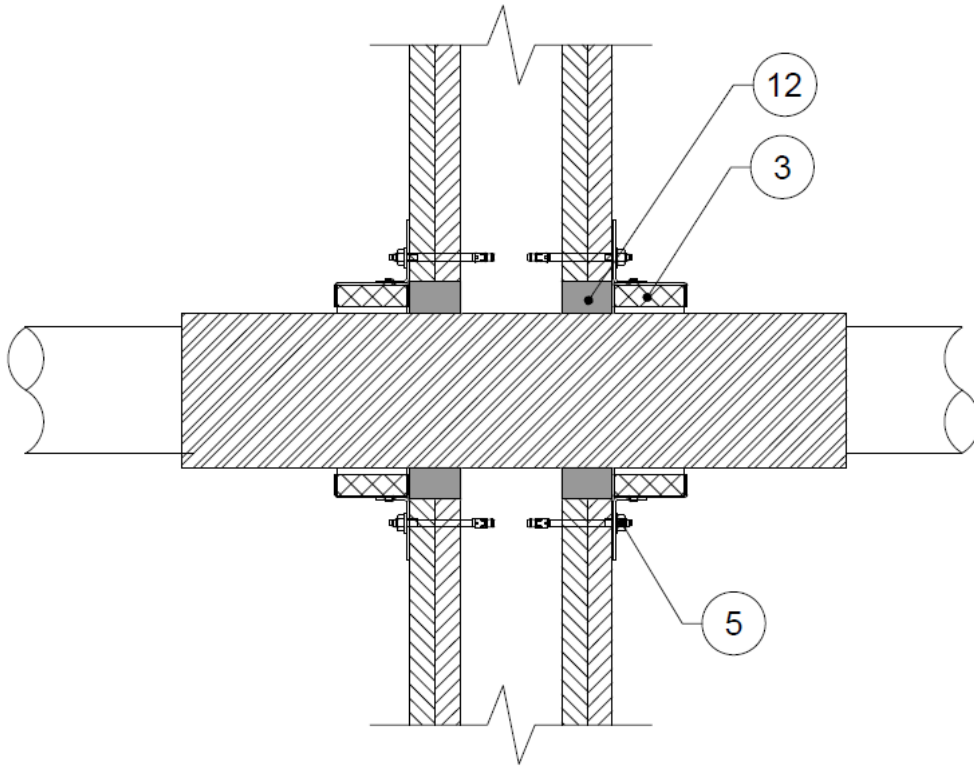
Sealant Detail around Insulated Pipes in Plaster board Walls
